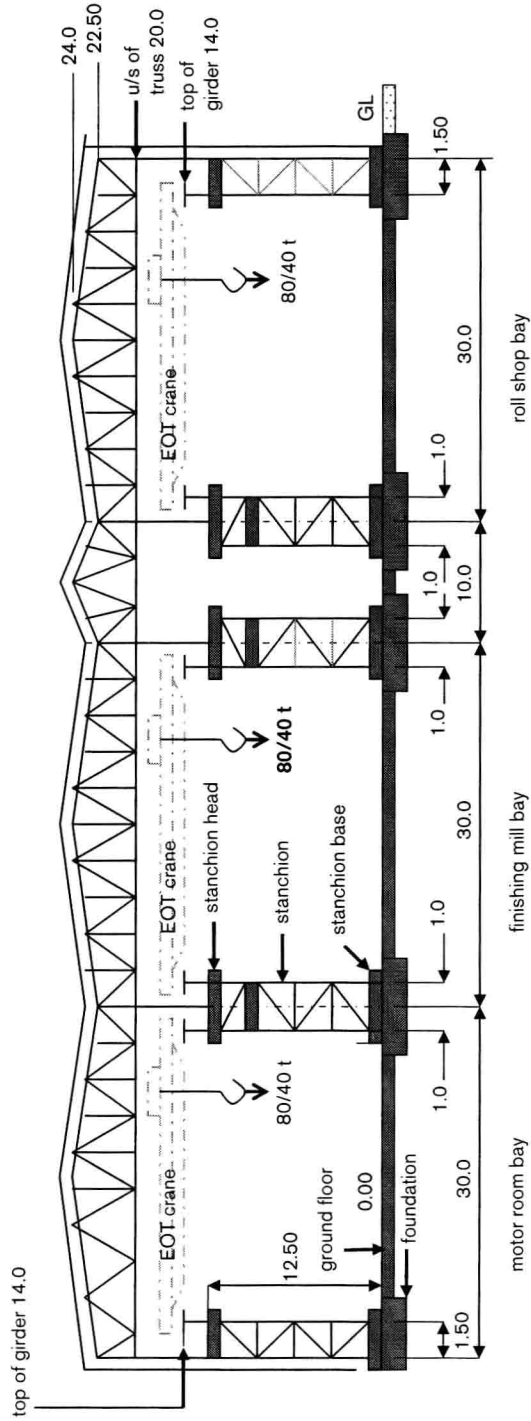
Section B.B (see Figs 1.1 and 1.2), showing structural arrangement
